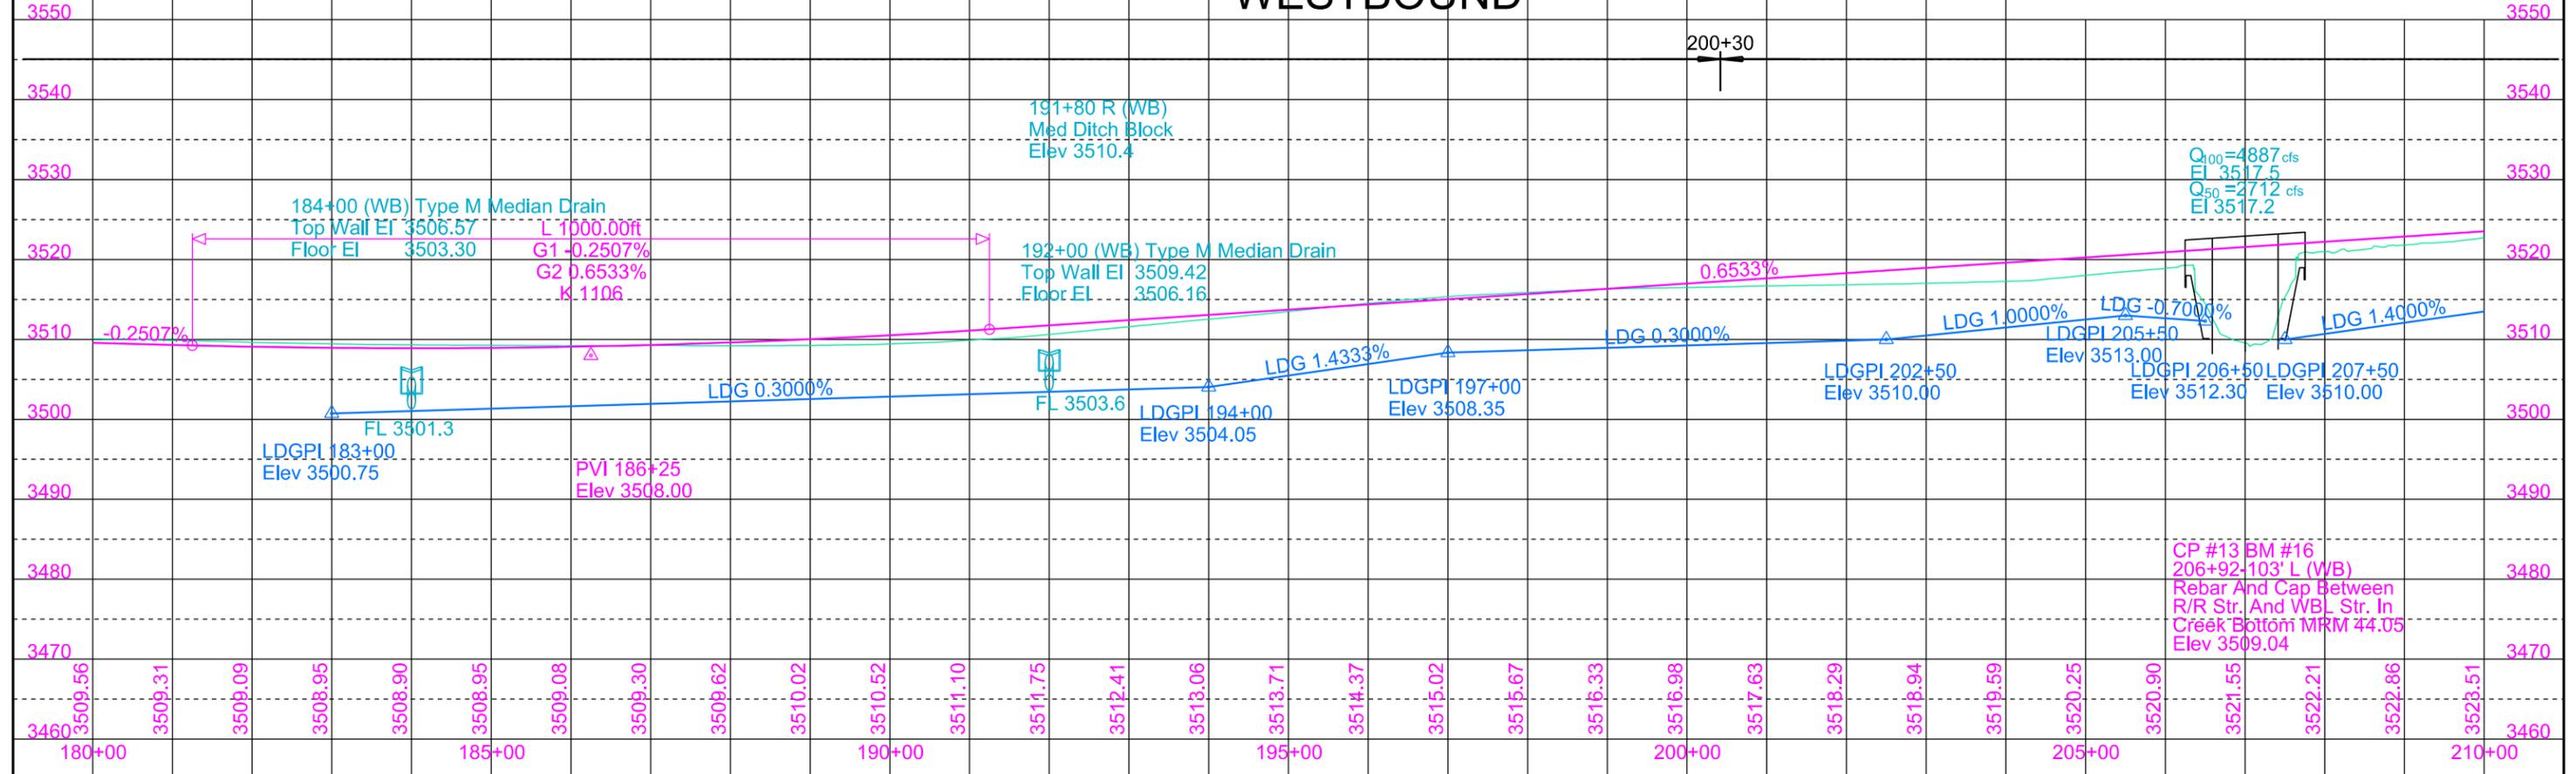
B14a Rural Profile with Bridge and Intersecting Road
